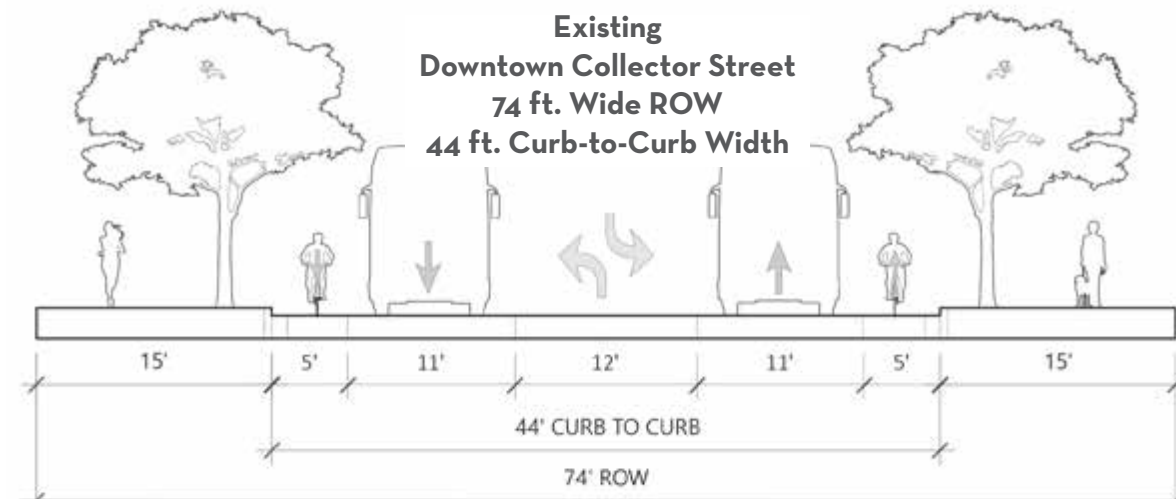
Existing: Typical Downtown Collector Street with a 74 ft. wide ROW and 44 ft. wide curb-to-curb. See Chapter 8D-1 Roadway Reconfigurations for minimum travel lane widths.
